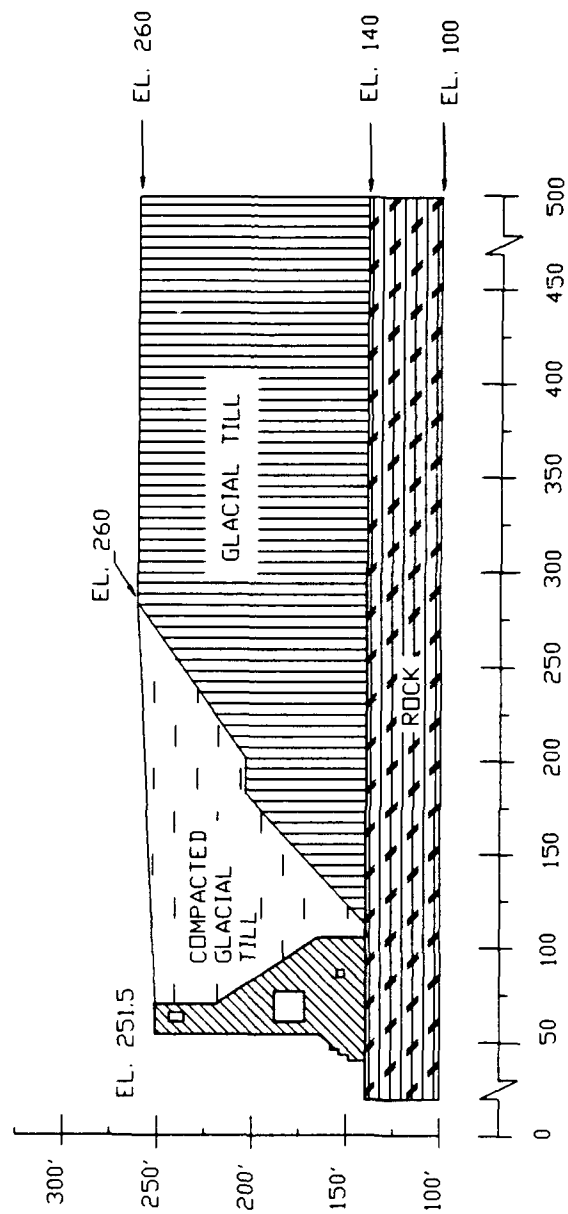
Configuration for the model of north chamber wall monoliths at Eisenhower Lock
